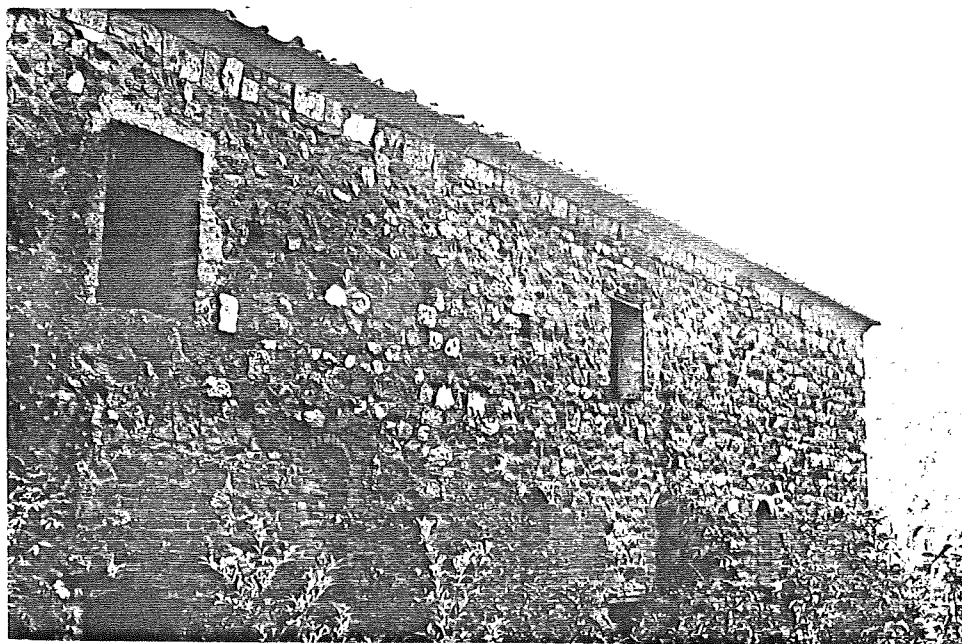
East facade of casa colonica, northern end (Appendix C, BUILDING PLAN 9).
